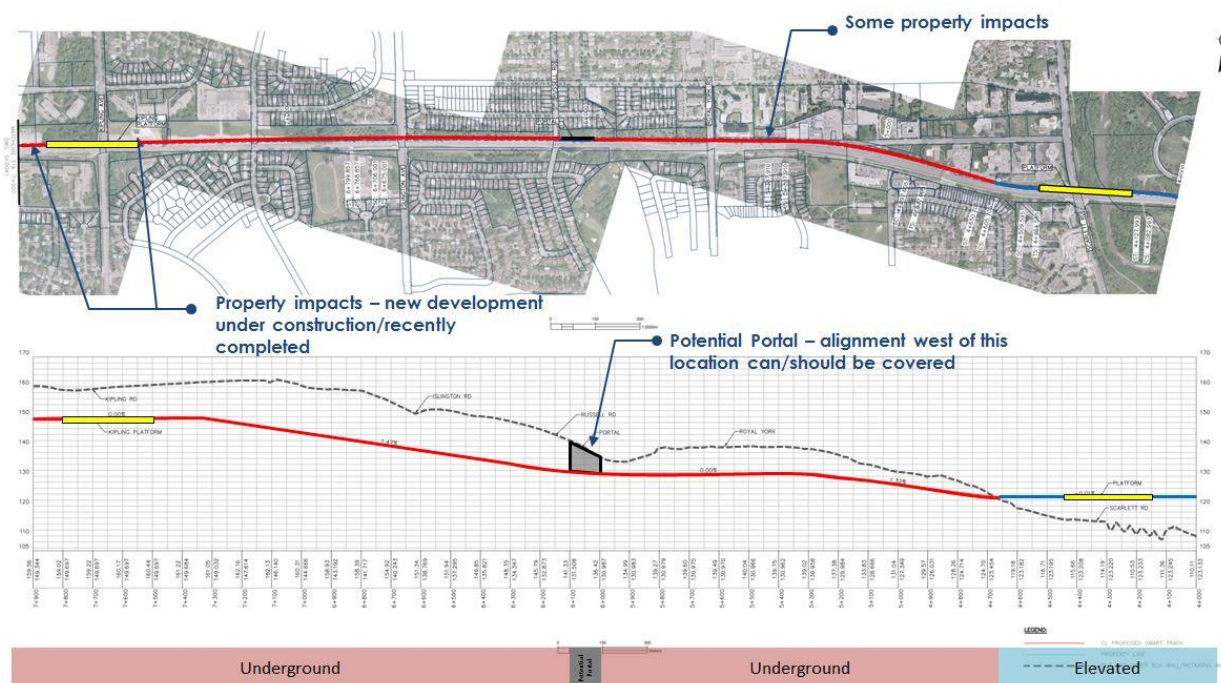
Plan and Profile for Open Cut on Eglinton (Scarlett Road – Kipling)
